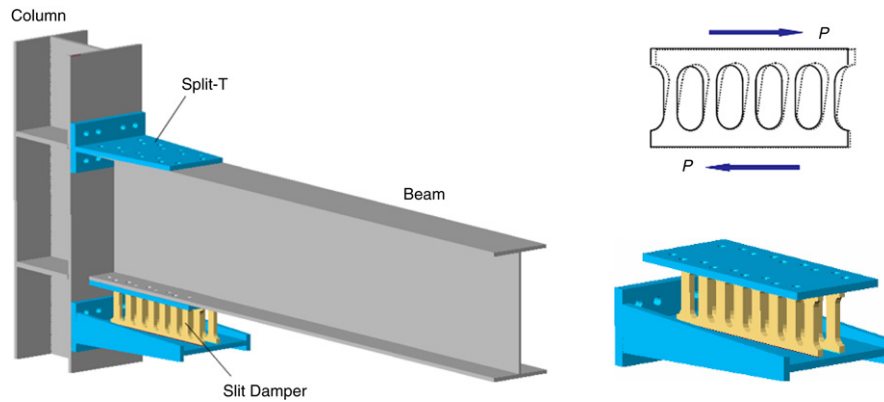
The proposed beam-to-column connection detail with slit damper.
